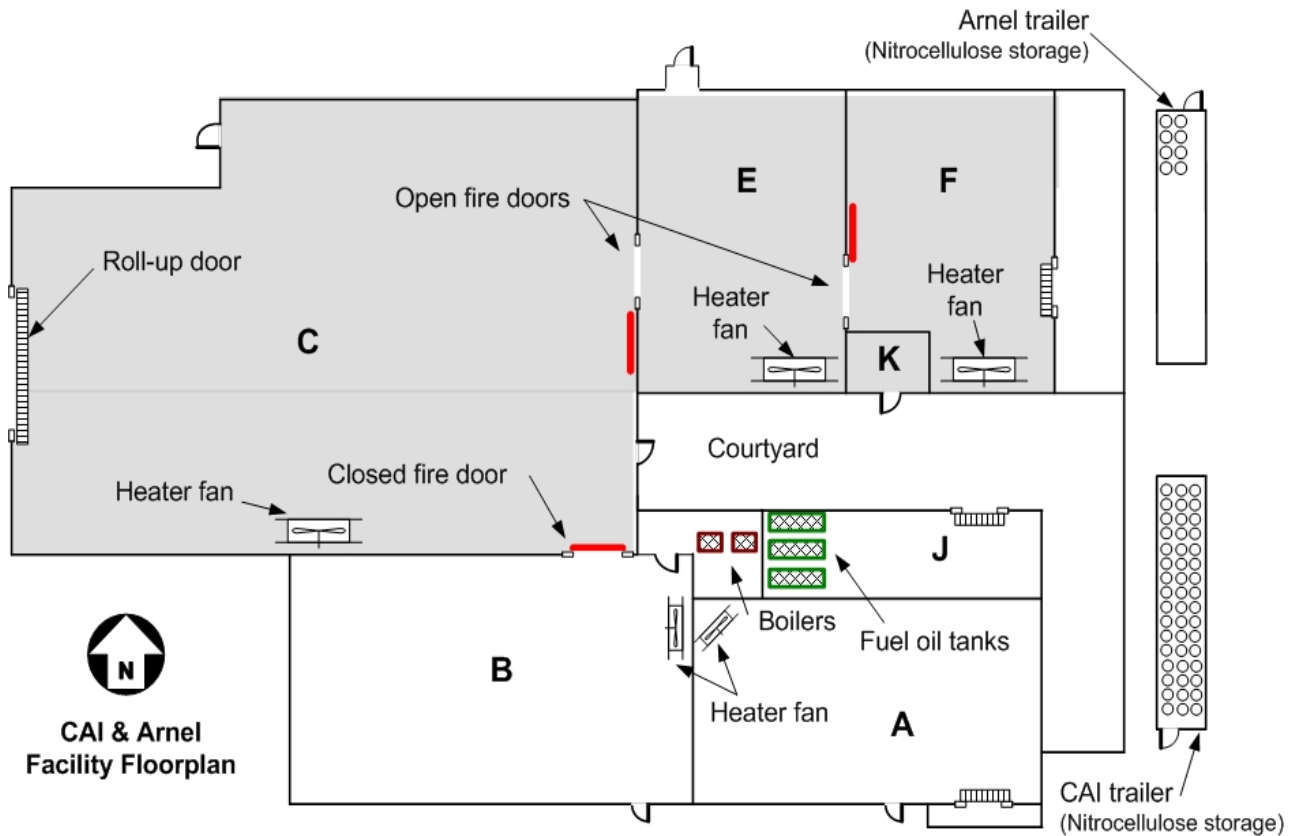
CAI/Arnel building layout. Production areas are highlighted.
